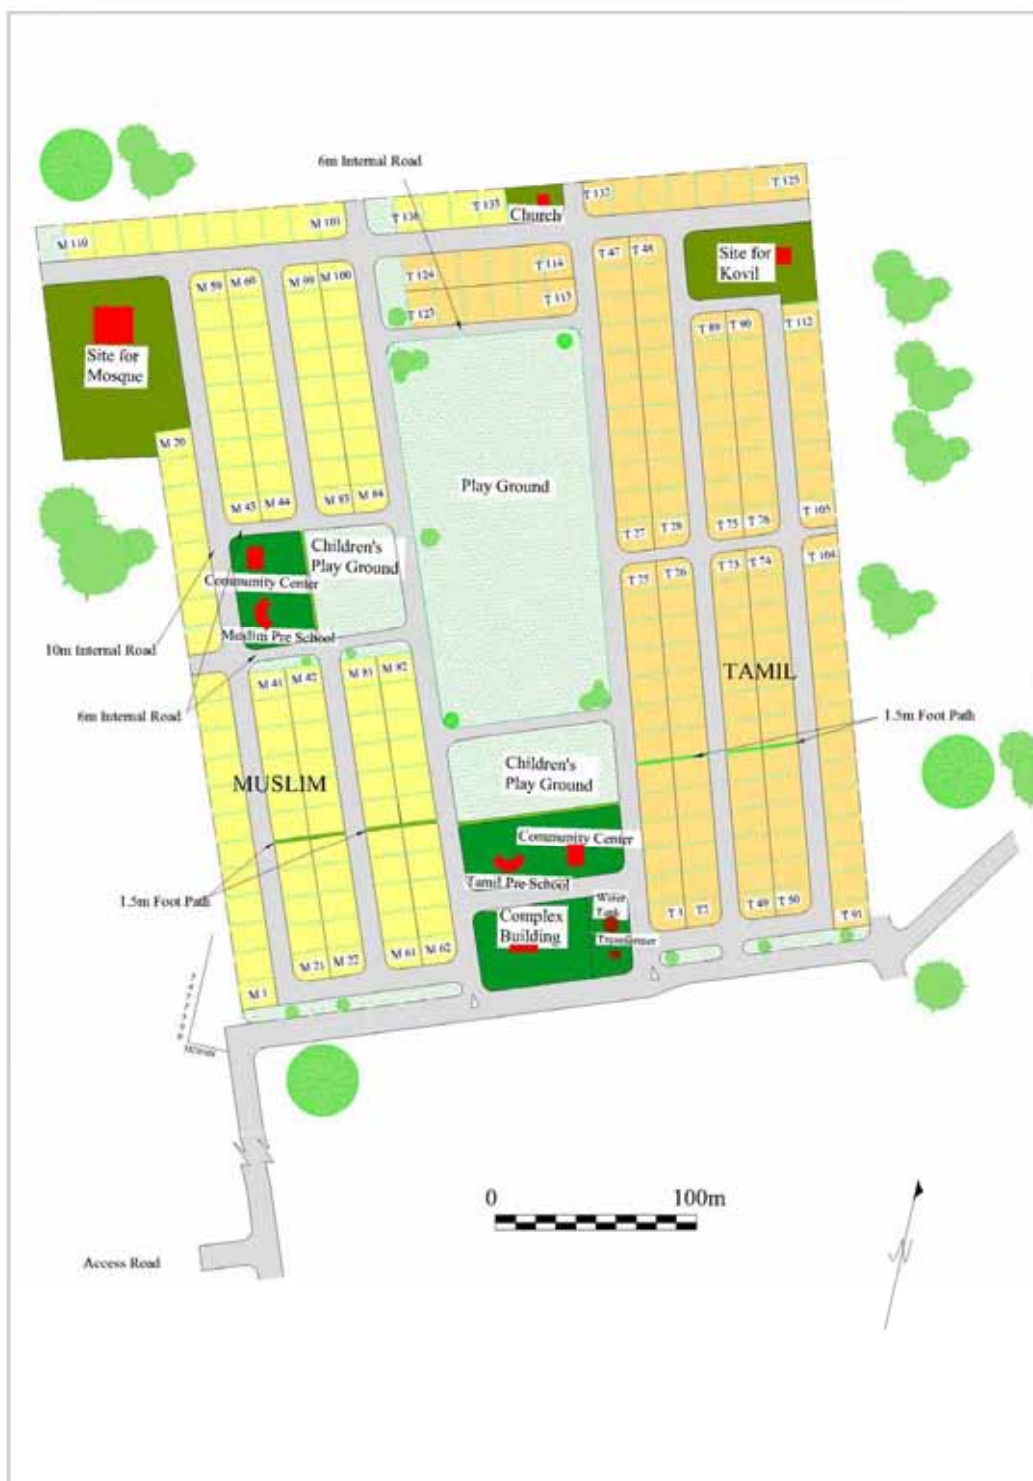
Layout Plan of Iqbal Nagar JSFV
